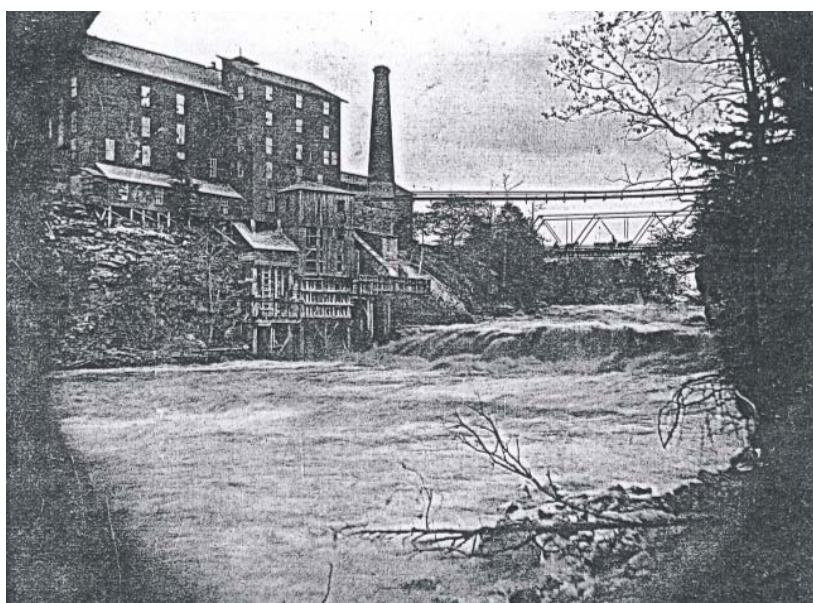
Rock and timber crib dam under the old Falls Street Bridge. Circa 1910. (approx. 30 feet up stream of existing dam)
